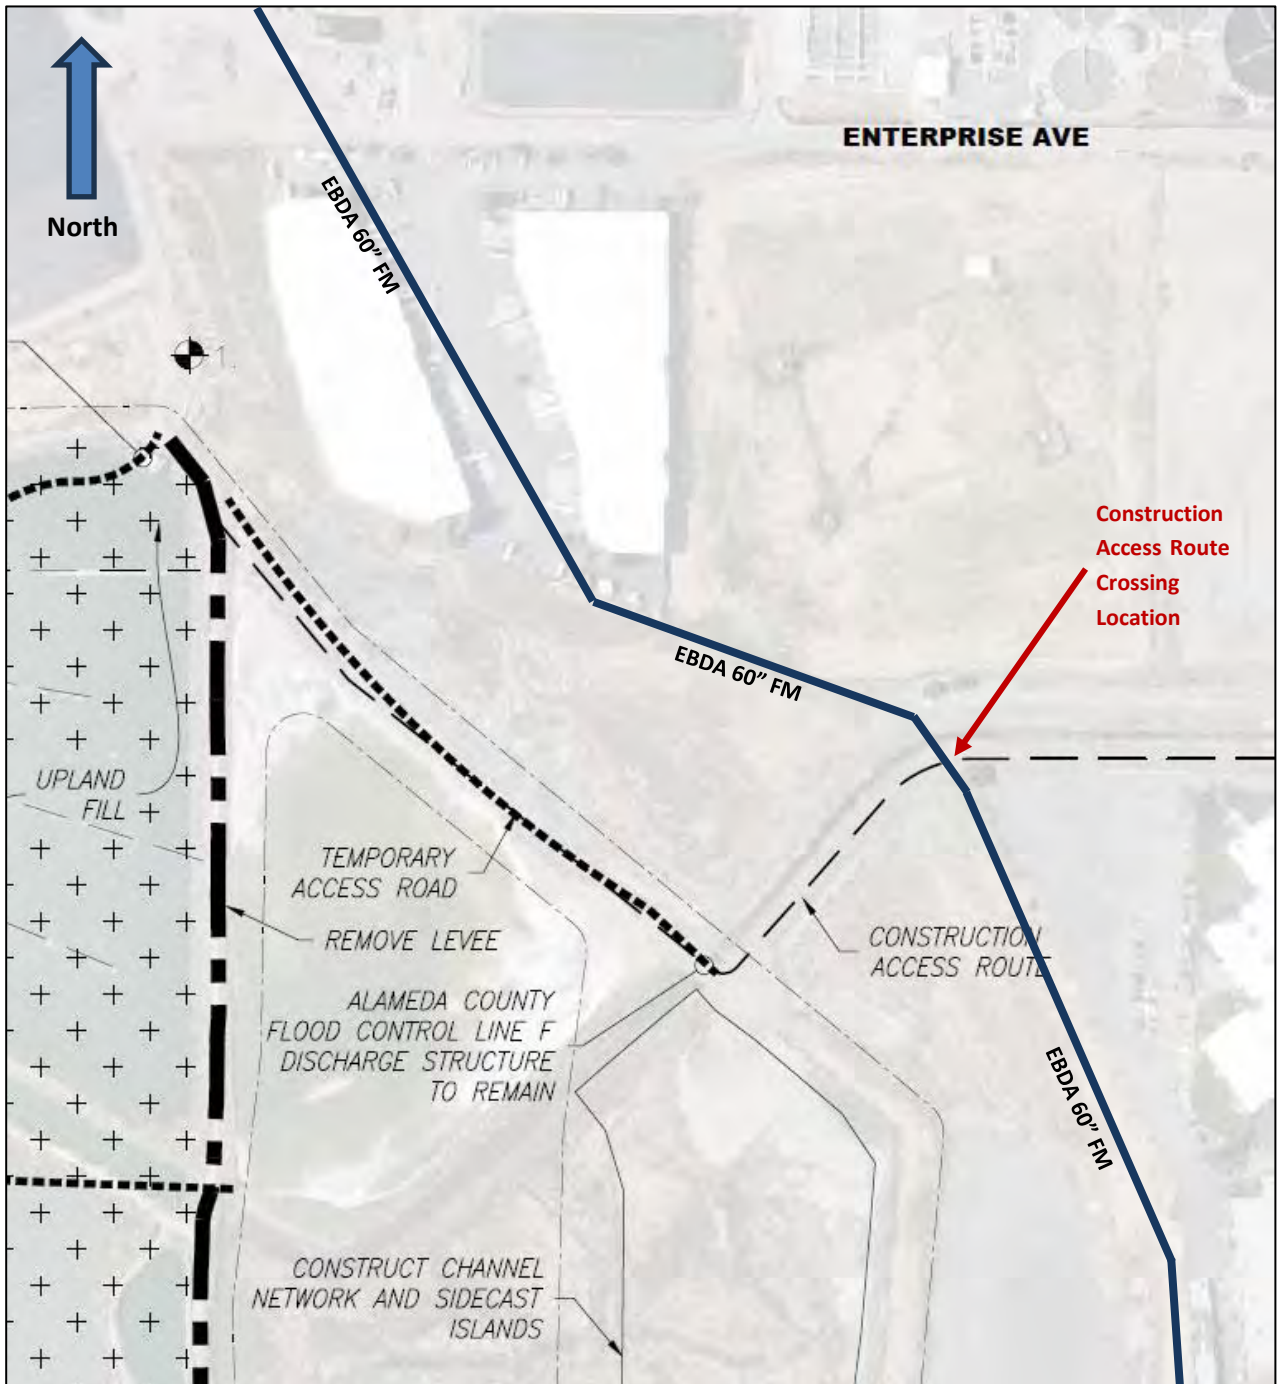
Location of EBRPD Construction Access Route crossing over EBDA’s 60-inch RCP Force Main pipeline. Import fill transfer trucks (both loaded and empty) are to use this construction access route that leads to Whitesell St. and Enterprise Ave.
